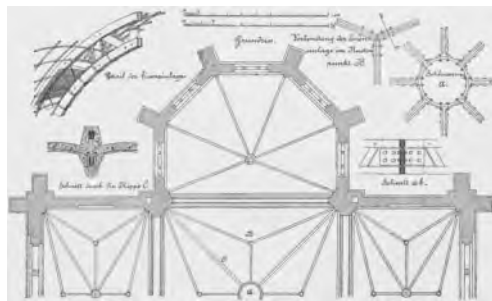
Gustav Adolf Wayss, Evangelical Church, Hagen, n.d. (Wayss 1887: 84).
